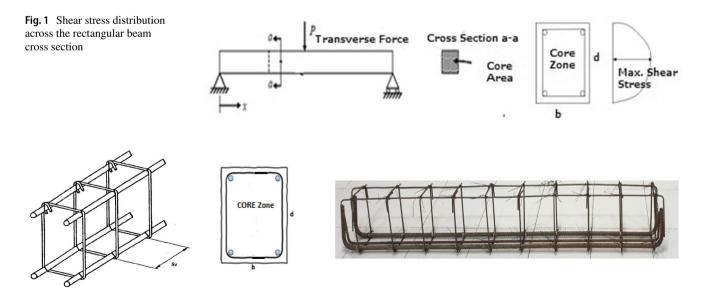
Reinforcement cage and cross section with conventional stirrups
